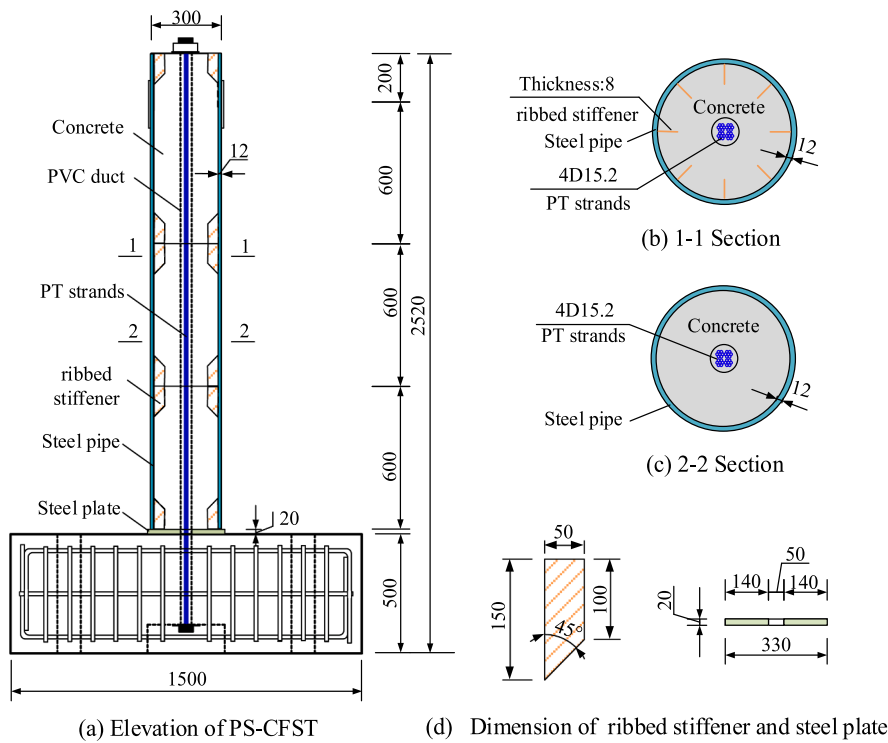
Configuration and section design of PS-CFST column (Unit: mm).
